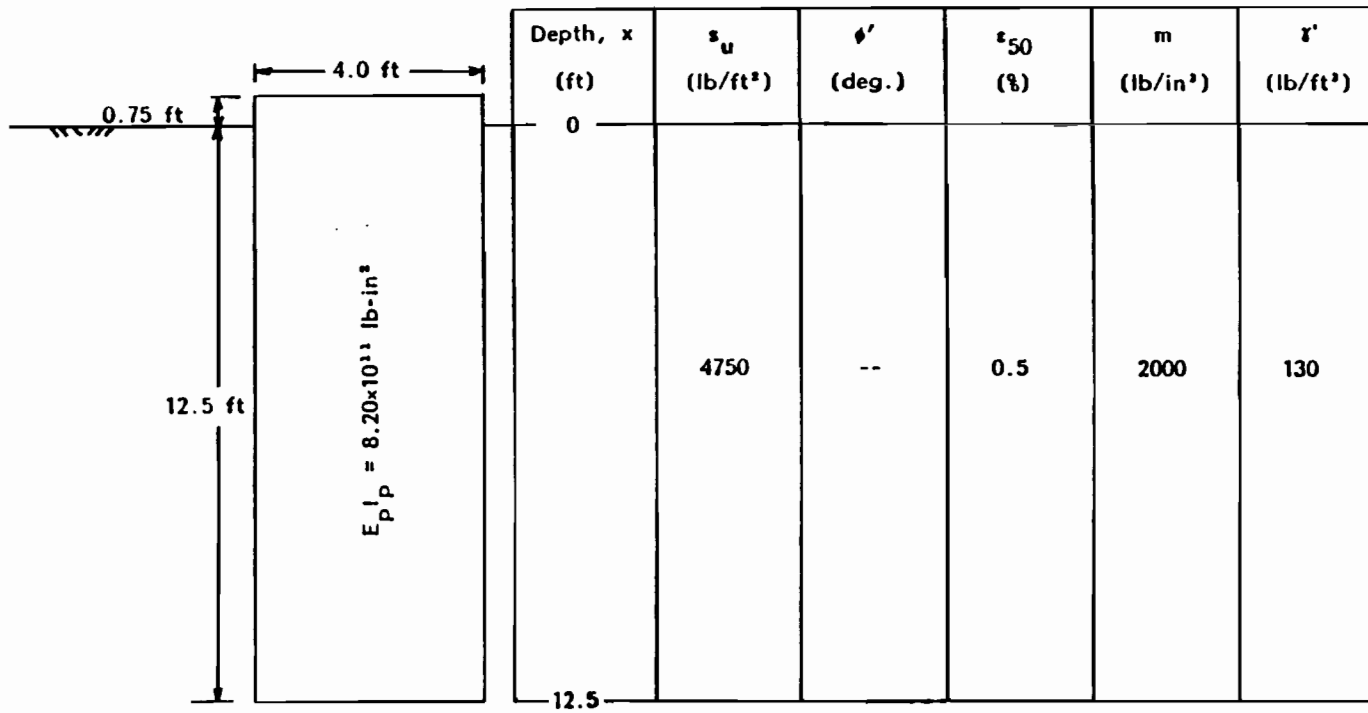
Soil and Drilled Shaft Data Used for COM624 Input, Shaft No. 22.
